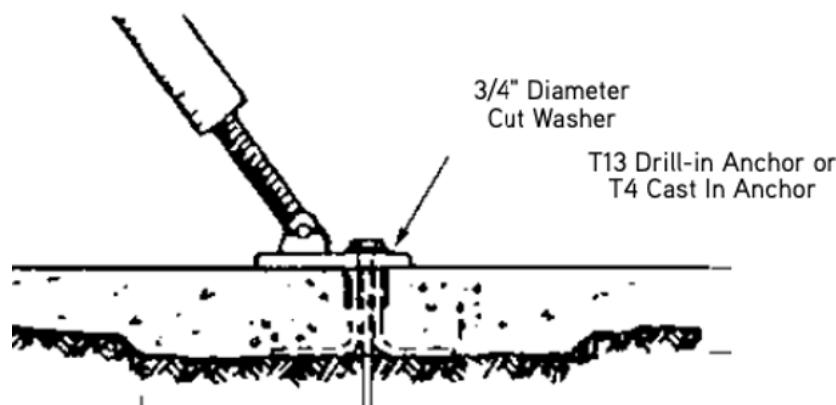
Slab-on-Grade Anchor (Reproduced from Dayton Superior, 2017)
